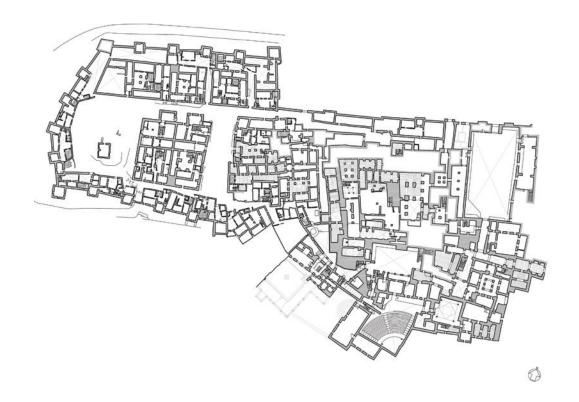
A measured line drawing of the floor plan of the Kasbah of Taourirt, Morocco. This record has been produced with total station survey, photogrammetry, and CAD. Source: Carleton Immersive Media Studio.
